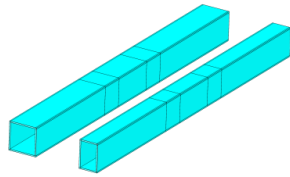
Rectangular steel tube of the light steel skeleton frame.
